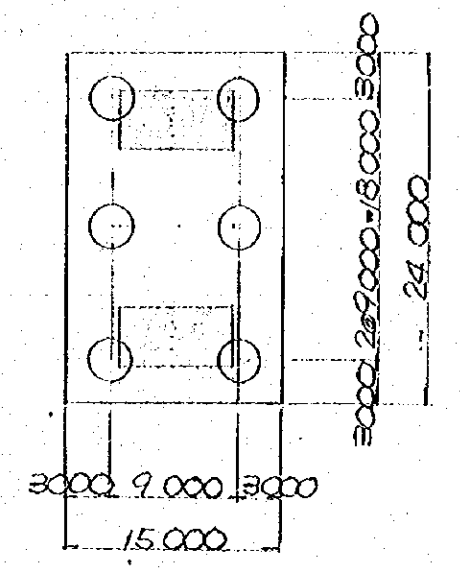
Outline of structure of multi-pile foundation.
